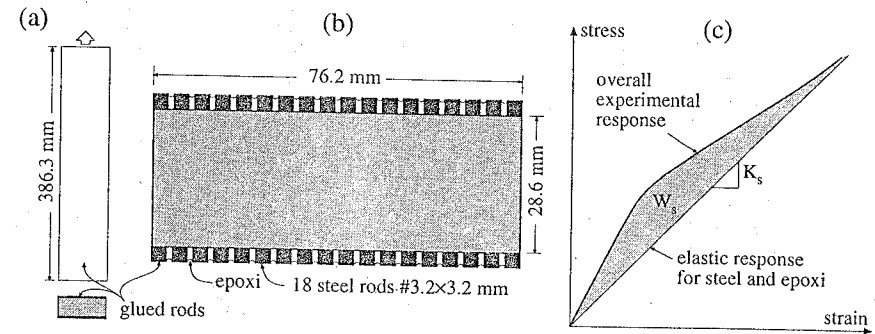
Bažant and Pijaudier-Cabot's (1989) method to determine the characteristic length for concrete: (a) sketch of restrained specimen; (b) cross-section with the arrangement of the steel bars at the surface of concrete; (c) sketch of the stress-strain curves for the specimen with the glued rods. (Adapted from Bažant and Pijaudier-Cabot 1989.)
